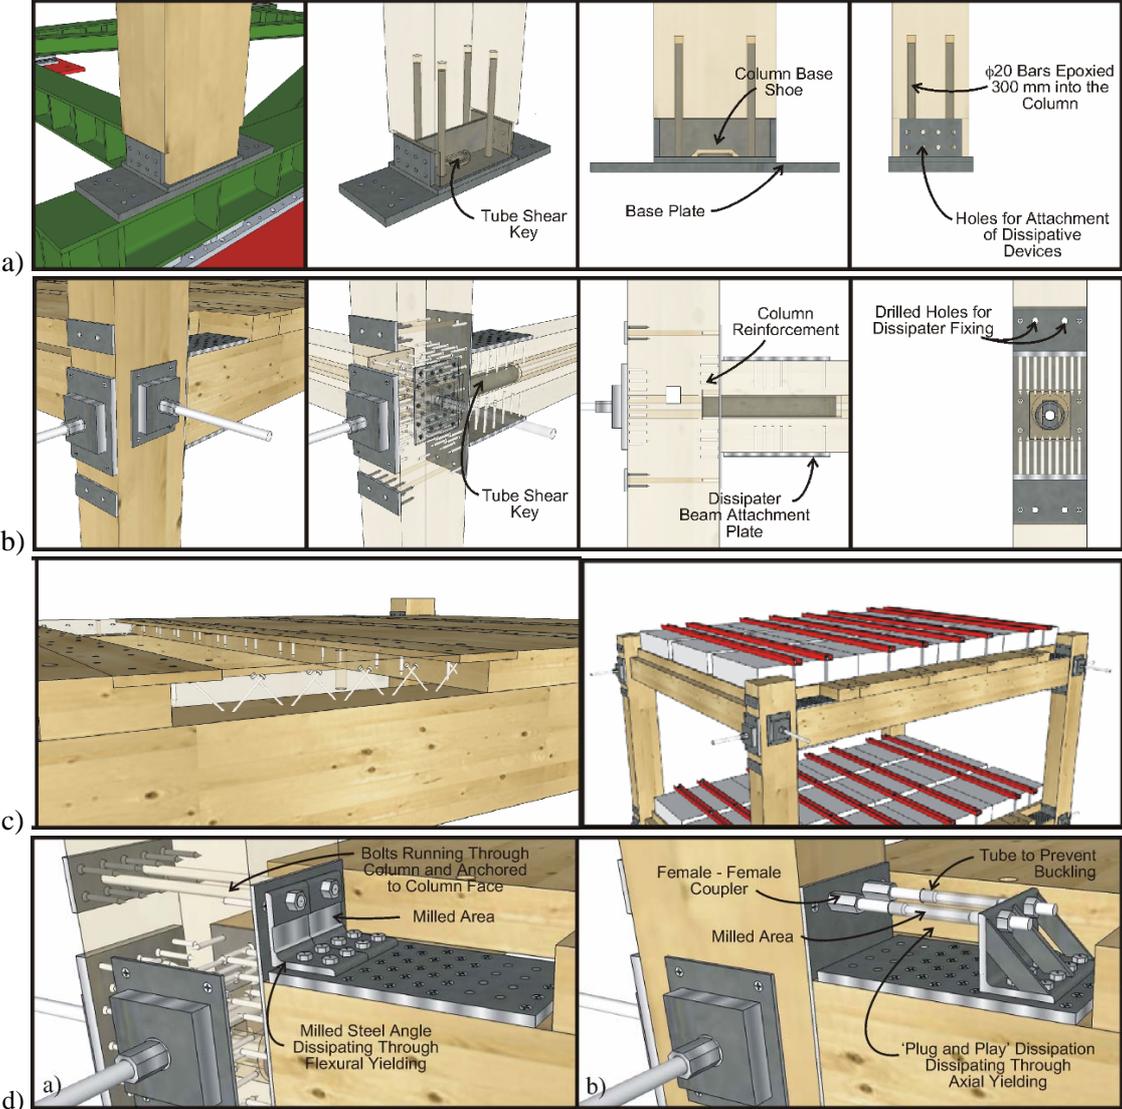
a) Post-Tensioned Glulam Frame Column-Foundation Connection b) Post-Tensioned Glulam Frame Beam-Column Connection c) Attachment to Glulam Frame and Timber Flooring with blocks d) (a) Yielding Steel Angle and; (b) 'Plug and Play' Dissipation Devices
